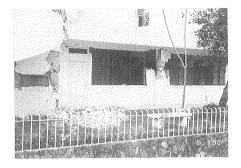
Shear damage to walls and columns in Quezon Hall at Teacher's Camp
